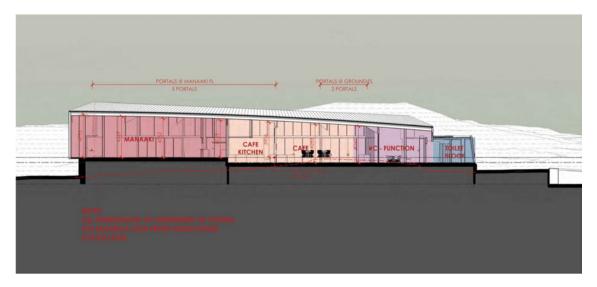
Elevation view of the building, facing Taranaki Mounga (TOA Preliminary Design Drawings - VE)
